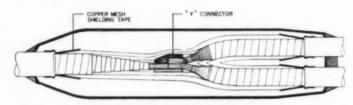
"Y" joint for single-conductor, paper- or varnished-cambric-insulated, lead-covered cables.
